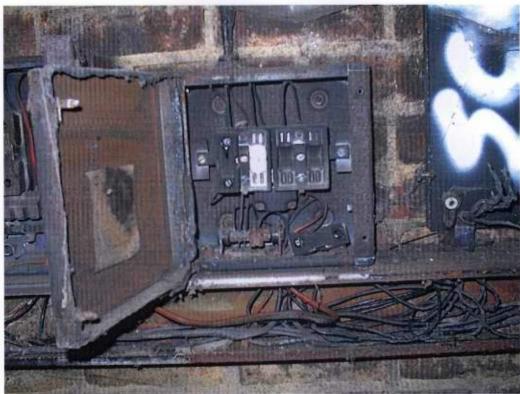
Small Block House adjacent changing block - rope flash guards with electrical fuse box
